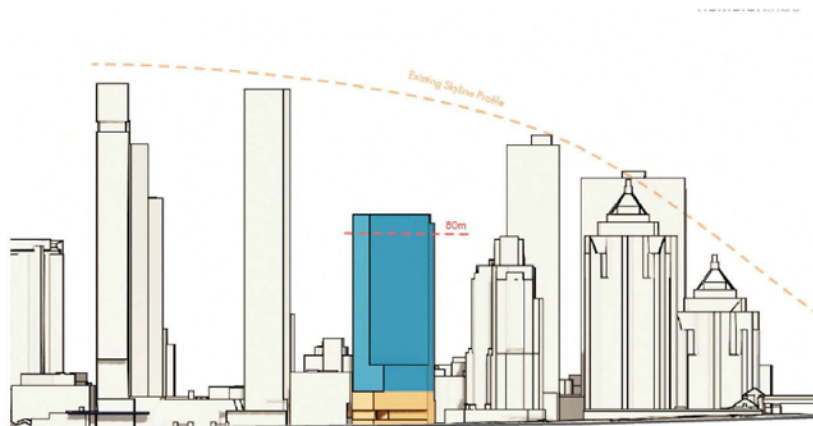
Existing Skyline profile - Victoria Avenue Elevation
